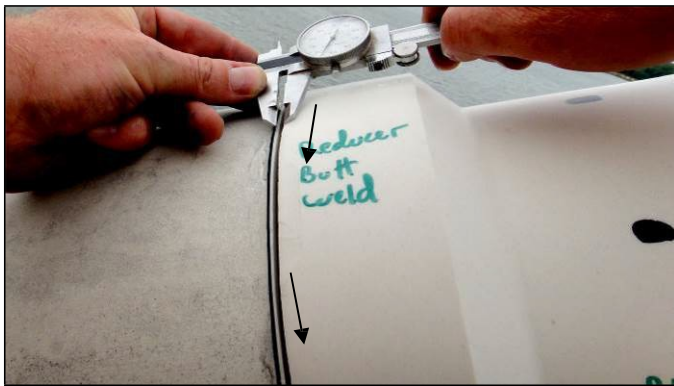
B4D: Reducer Crack Adjacent to Stay Pipe Butt Weld
